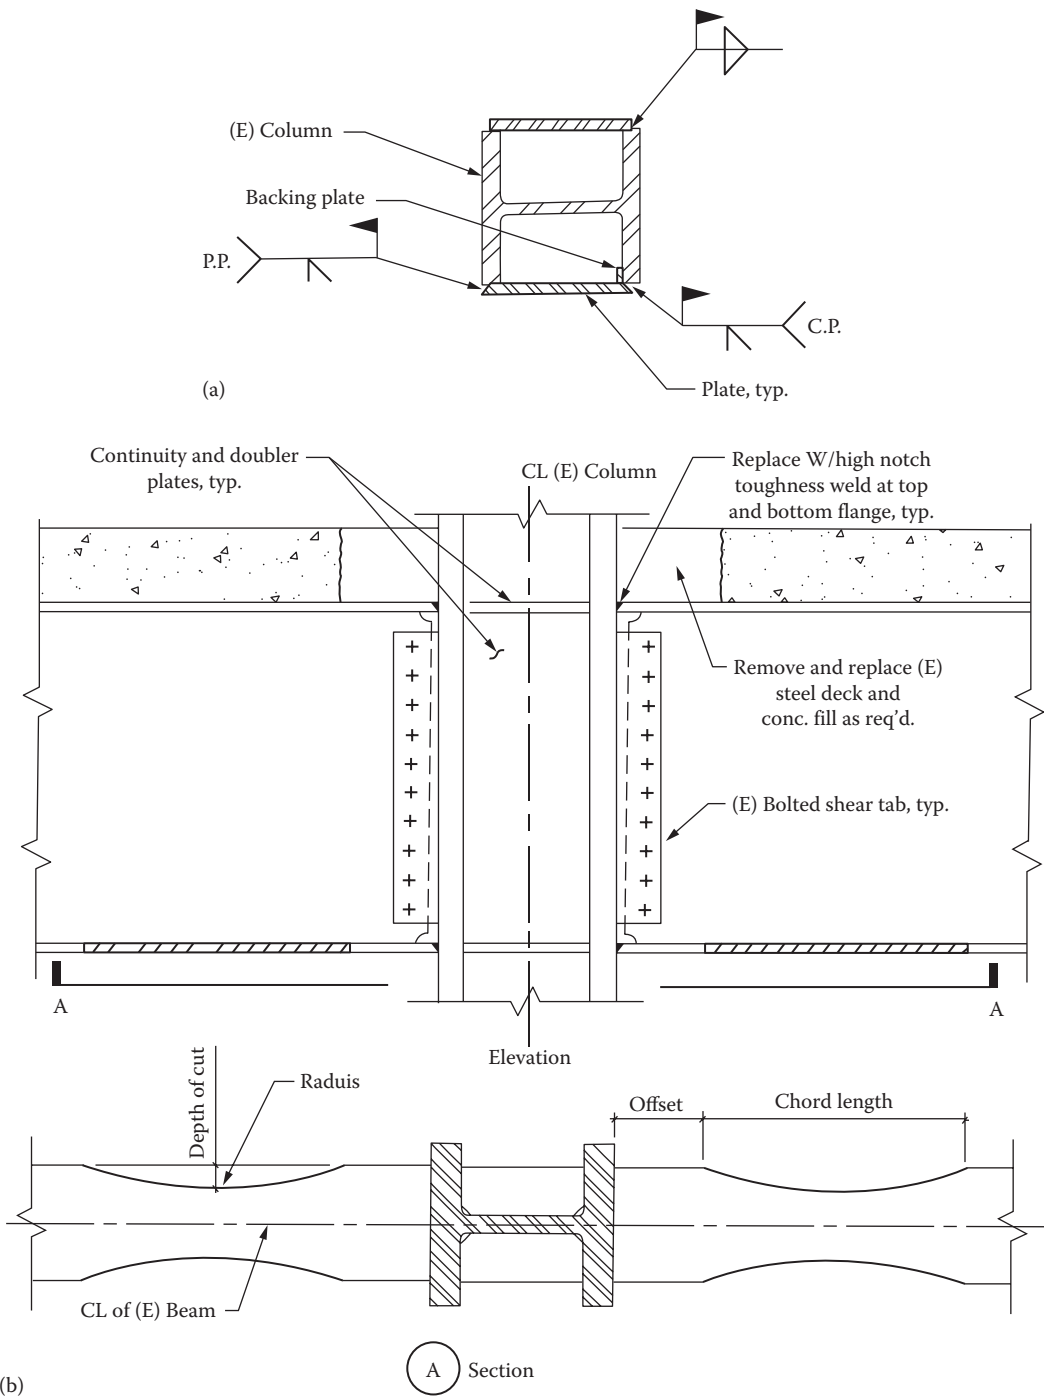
(a) Box section at existing column. (b) Reduced beam section at bottom flange of existing beam. *Note:* Welds shown indicate alternate possibilities of plate attachment.
